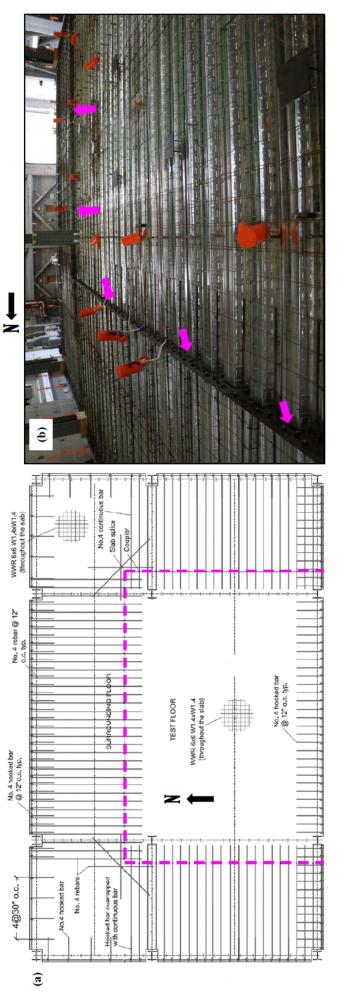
(a) Image showing the slab splice (pink dashed line) and (b) Construction photo showing the slab splice prior to the first concrete pour.
